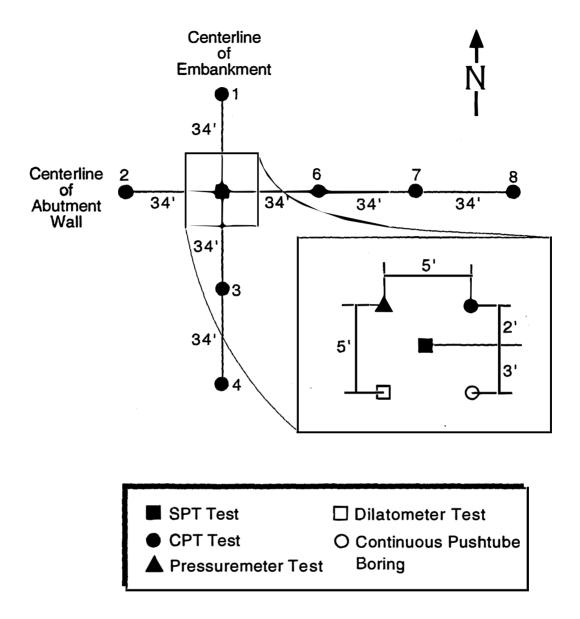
In-Situ Test Locations at U.S. 177 Project Site (19)
